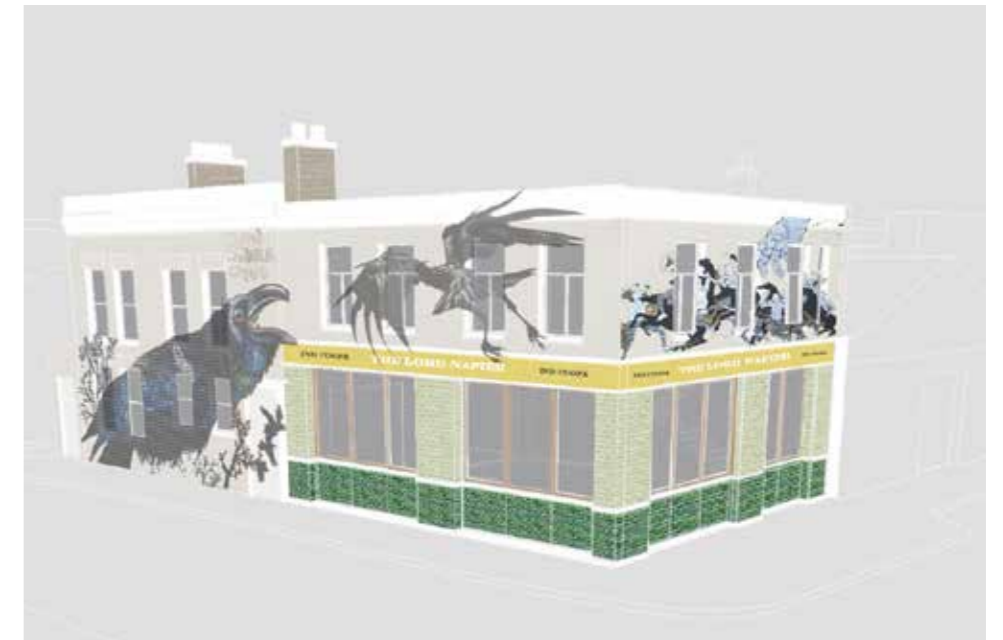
Diagram showing Lord Napier one year on with new commissioned artwork (indicative only) covering masonry elements. Hanging signs and roof access not shown.
